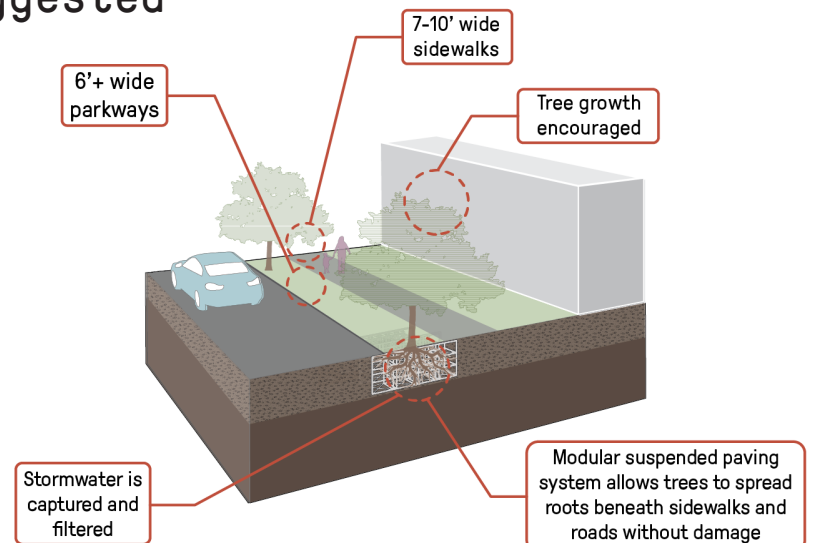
Existing vs. Suggested Street Tree Planting Design (following page). New development in Signal Hill should implement the planting design strategies from this document.
